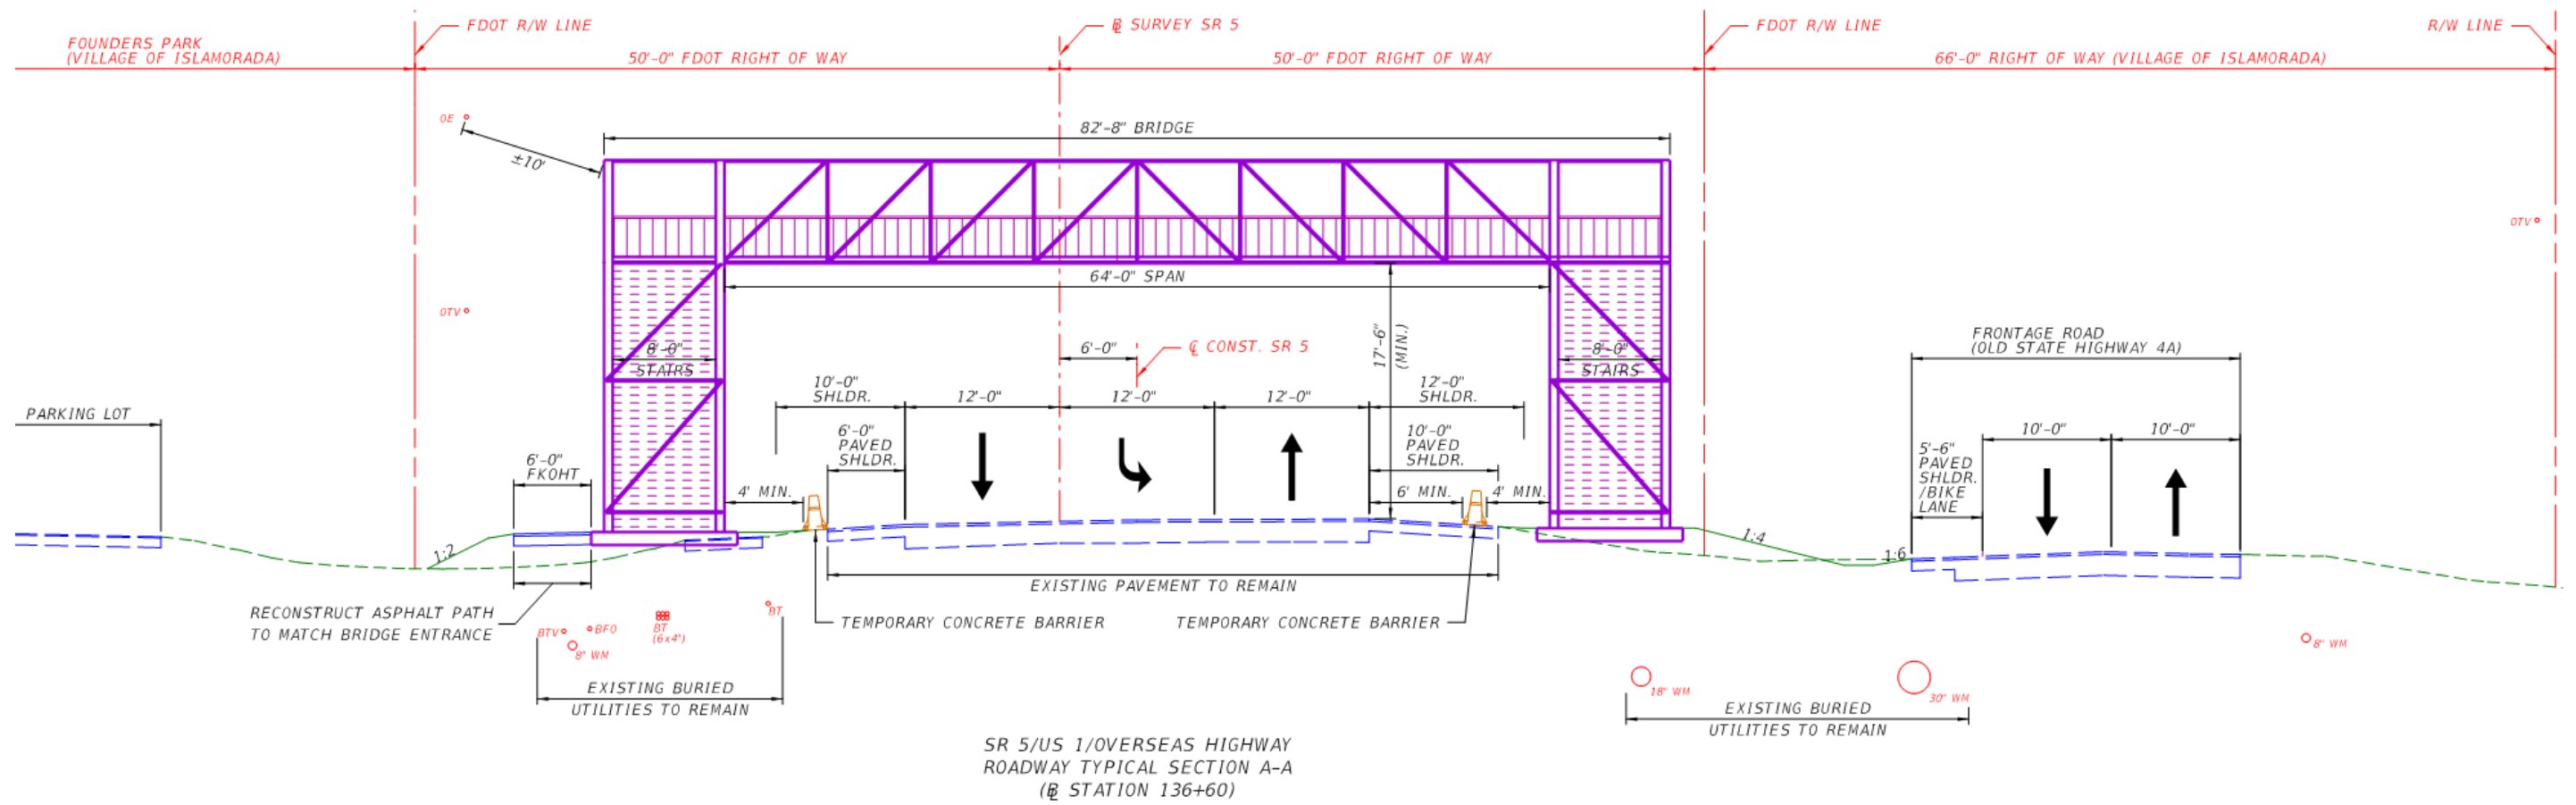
Location 1 Temporary Pedestrian Bridge Concept – Structural Plan & Elevation
